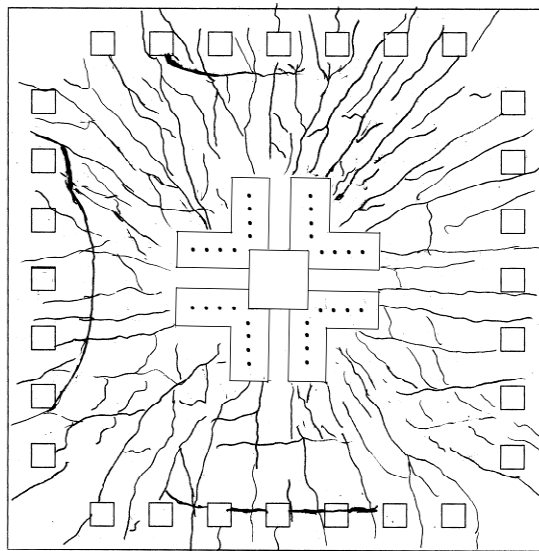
Failure surfaces and crack patterns of specimen OS13
